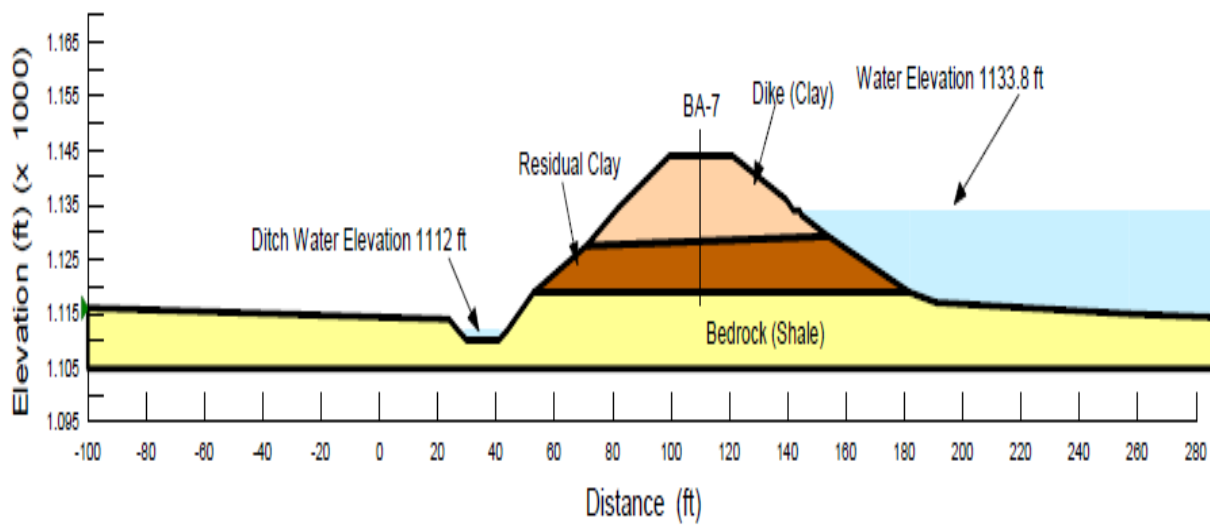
Typical Bottom Ash Disposal Area 2 Cross Section
